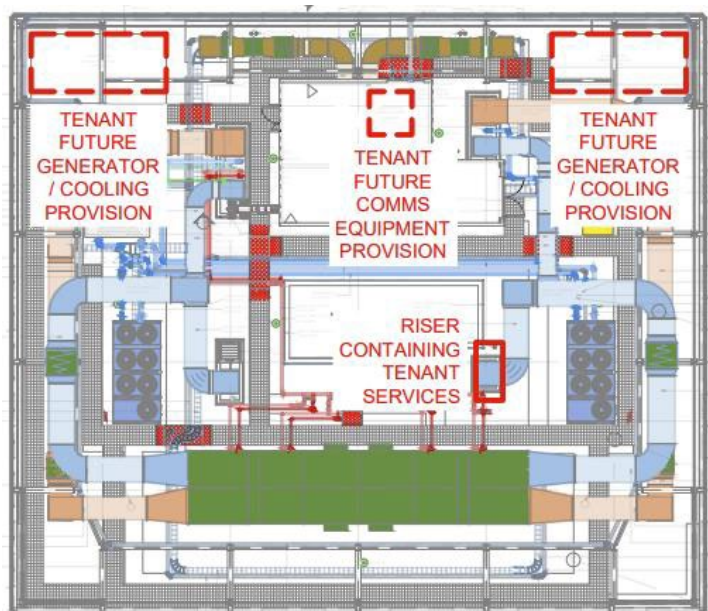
TENANT SPACE ALLOCATION AT ROOF LEVEL
